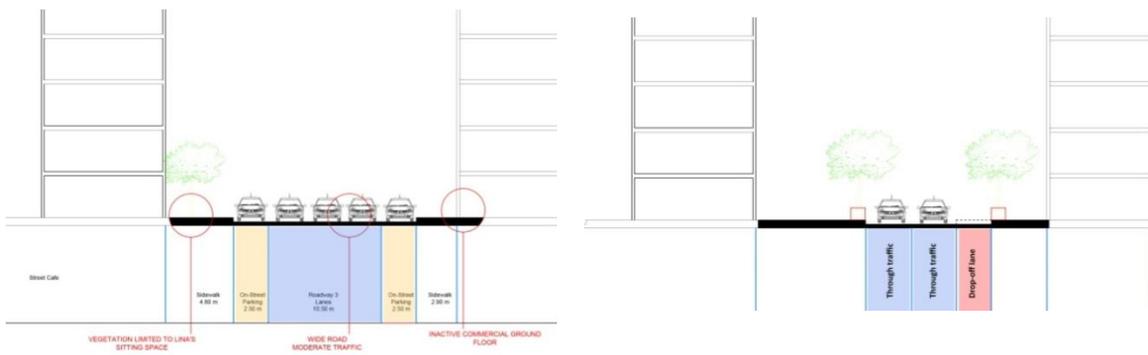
Proposed through traffic and drop off lanes (Author 2019)
